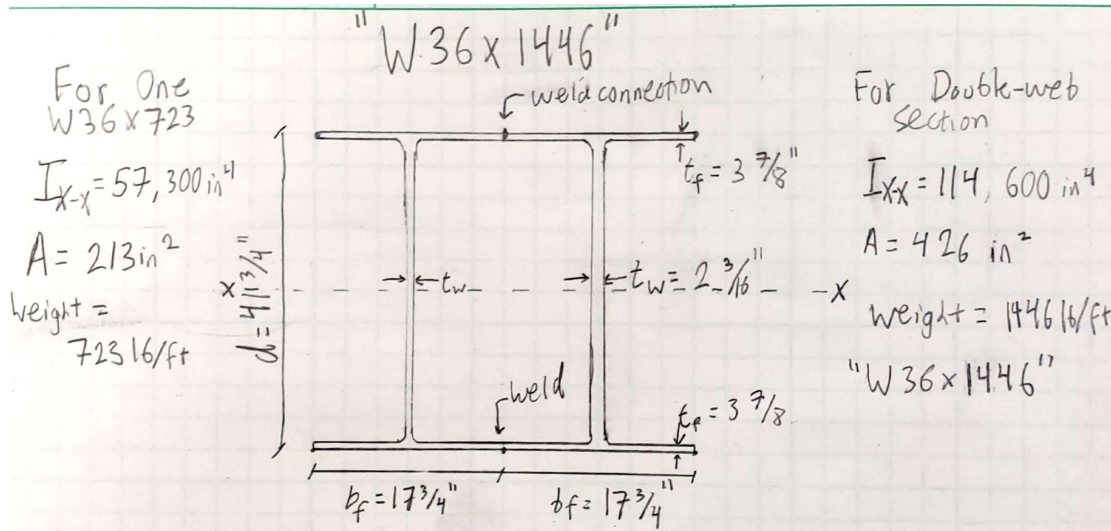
Detail and Section Properties for the W36x1446 Long-Span Girder
